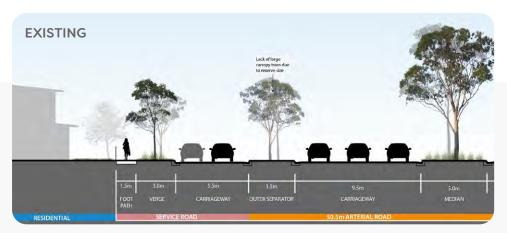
An example of a typical one-way service road, with on street car parking, a generous traffic lane, footpath, standard verge, and an outer separator (Typical - outer separator width varies)
